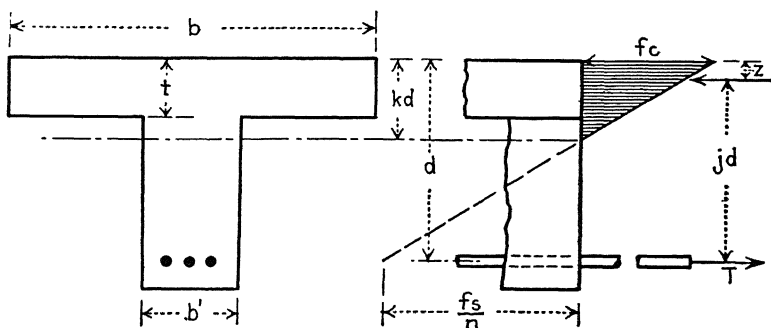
Nomenclature for Reinforced Concrete T-Beam.
